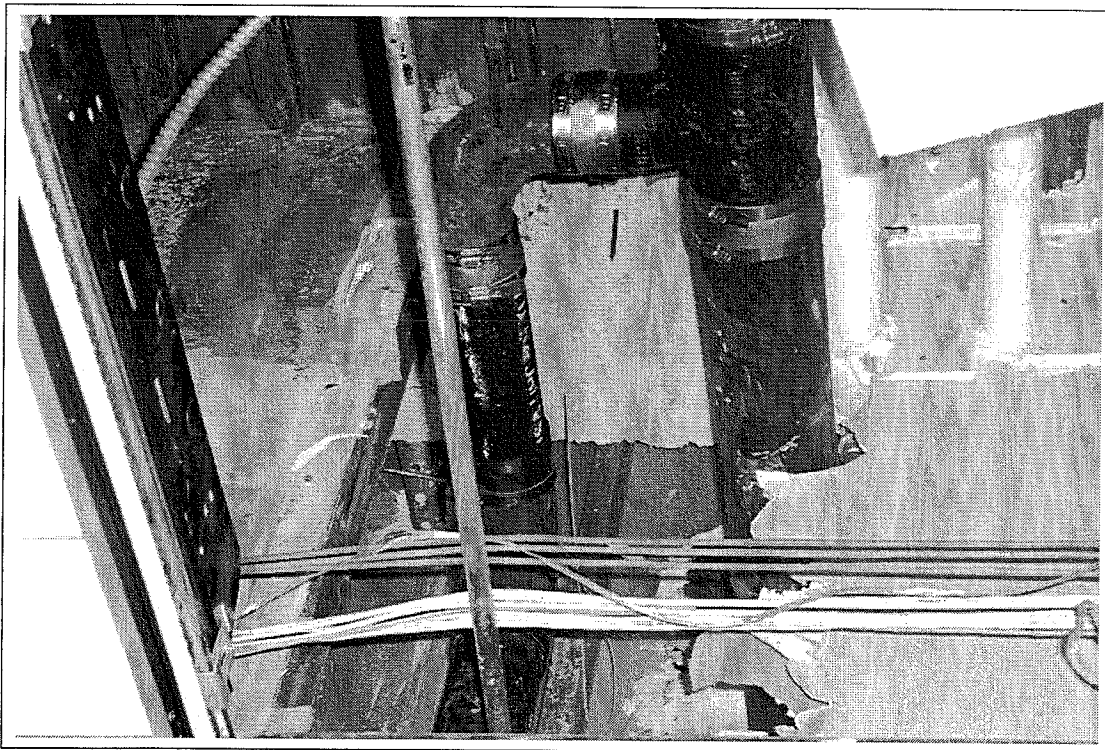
Annex 6th floor, adjacent to Women's RR - Close-up view of fireproofed beam above suspended ceiling and wall chase
